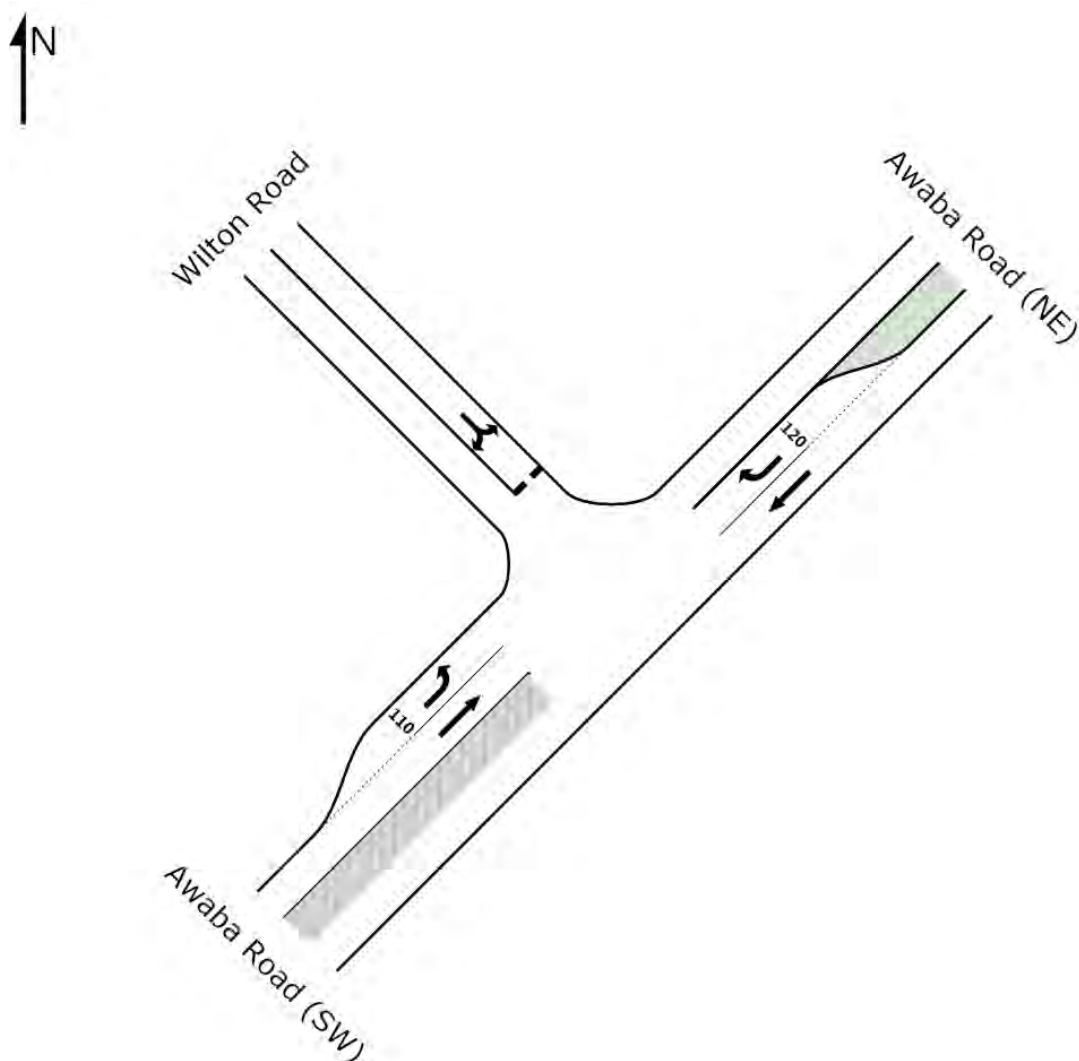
Existing Intersection Layout Wilton Road/Awaba Road/Cessnock Road
